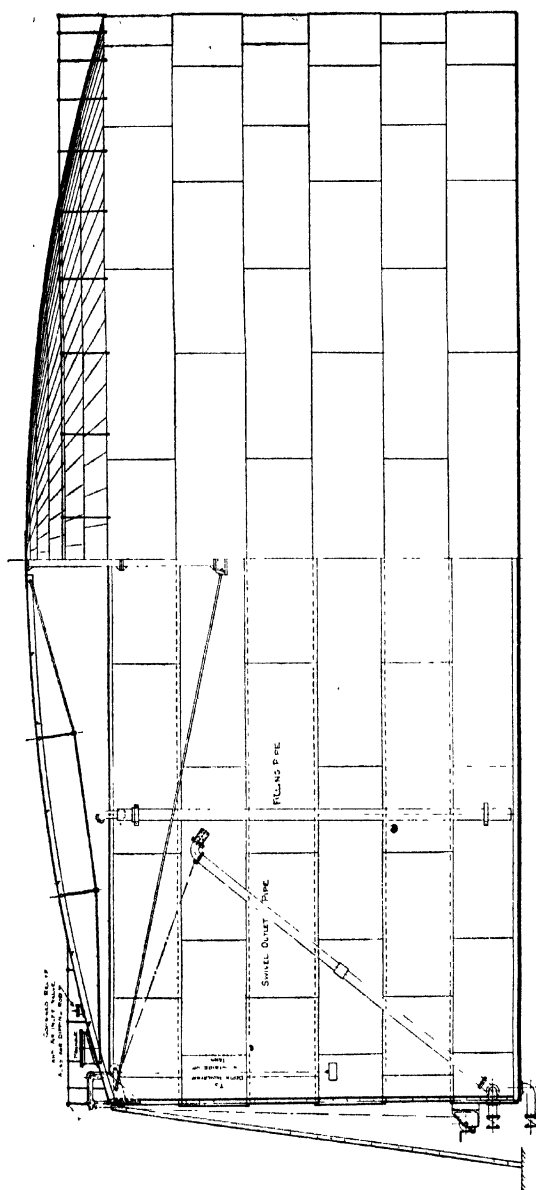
Typical Steel Oil Tank, showing all customary attachments and fittings.
